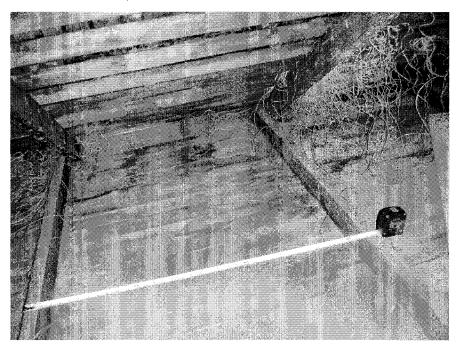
Roof ceiling framing is spaced at 38" c.c.
